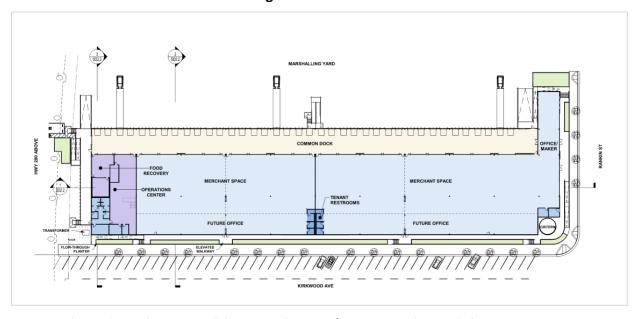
shows the street and marshalling yard planned improvements, and Exhibit 2 shows the proposed design for 1900 Kirkwood Avenue.
